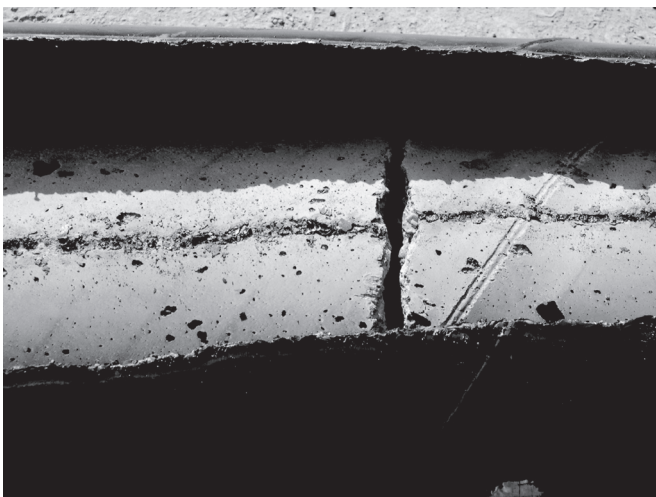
Photo of the concrete core and damaged concrete region after completion of testing.
